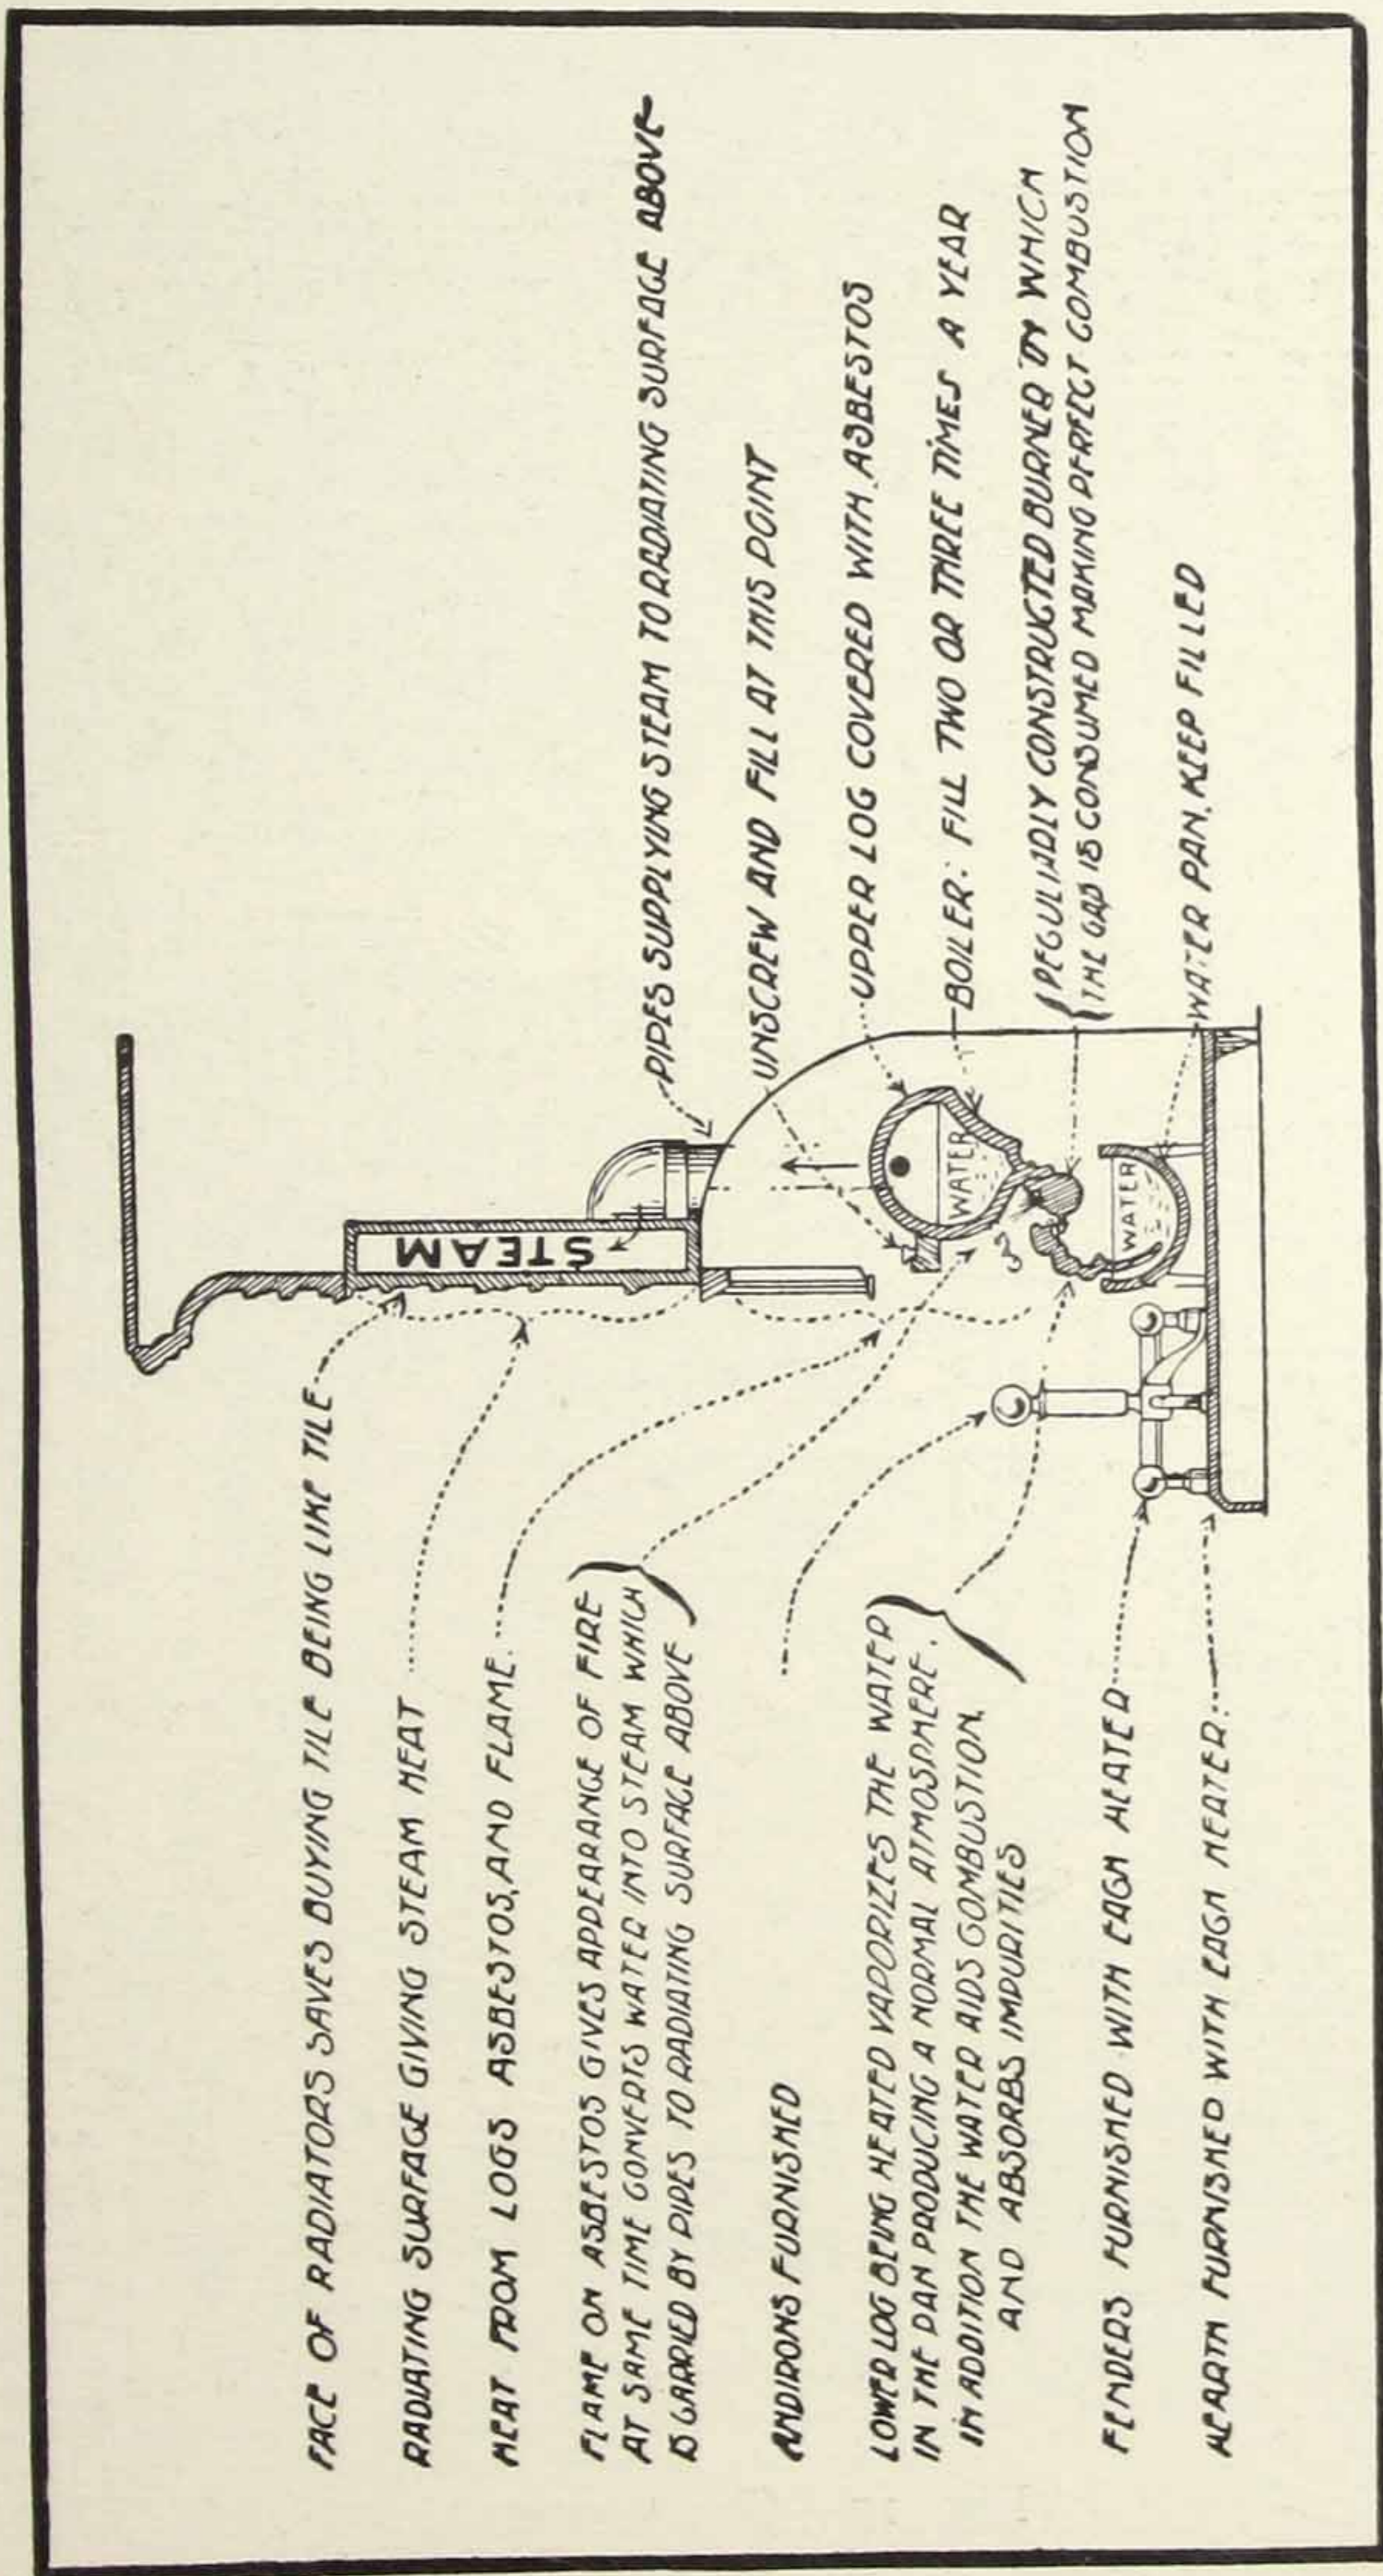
Sectional view of Heater similar to that shown in Fig. 16a.
